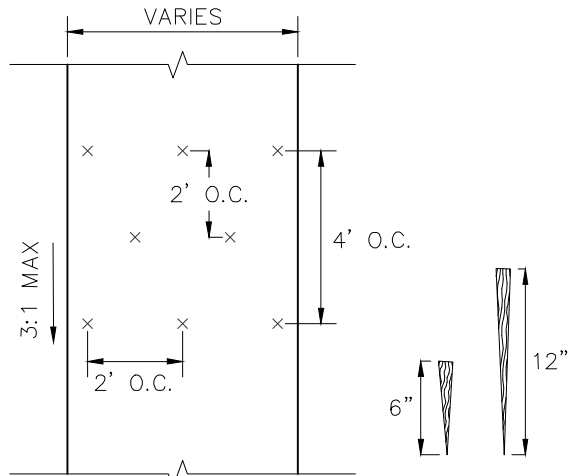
FIGURE C: TOE STAKE SPACING PLAN VIEW – NTS
